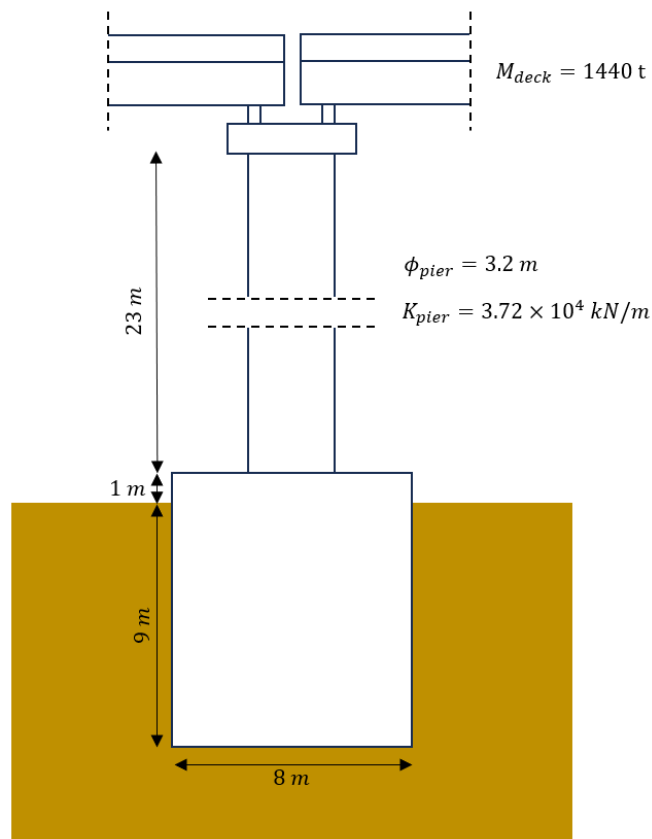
Unscoured foundation – Geometry and structural parameters of the case study
